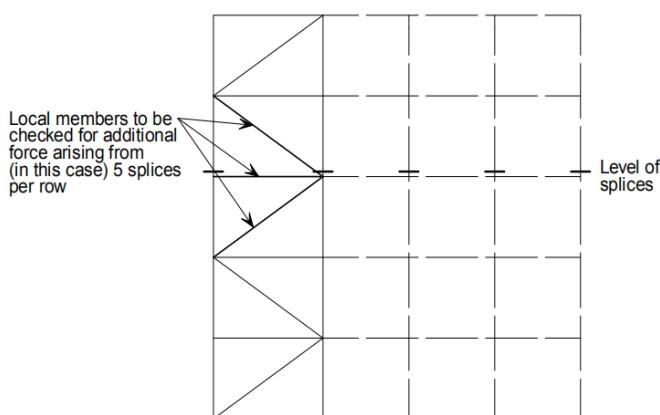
Check for bracing members. Retrieved from “Steel Building Design: Medium rise
